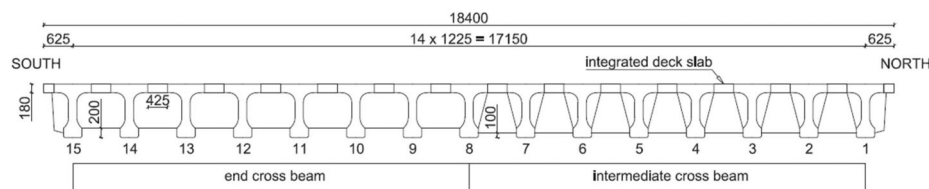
Cross-section of Vecht Bridge with 15 bulb-T girders (measurements in cm) (Ensink, 2024).
